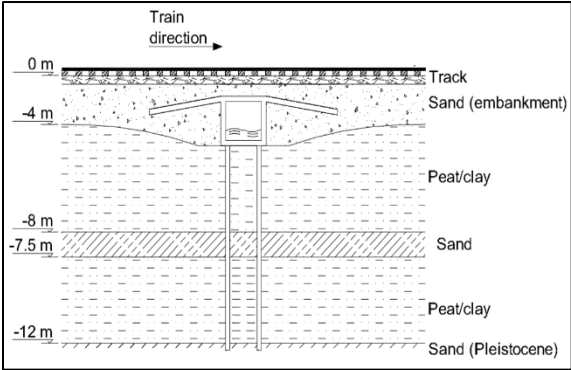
Interpreted soil profile for the «Gouda Goverwelle culvert», showing that the railway track was founded on soft clay but culvert on piles (Modified after Coelho, B, 2011)
